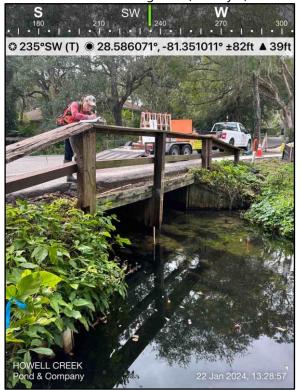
Structure 25; Concrete and Wooden Retaining Wall (Priority 0)
